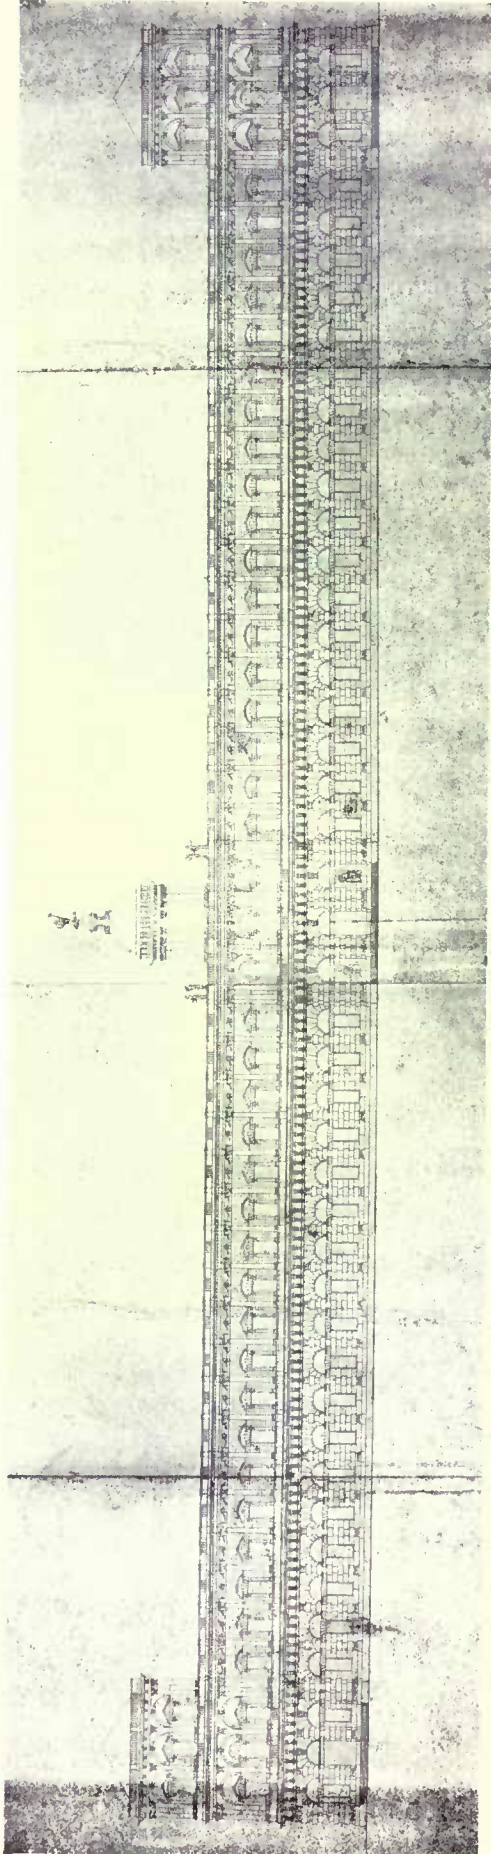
EAST ELEVATION OF THE SAME DESIGN AS FIG. 11
